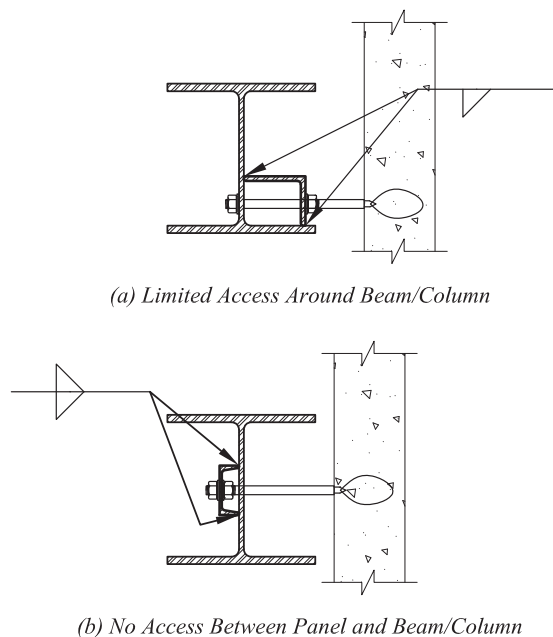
Tie-backs with little or no access around beam/column. (Adapted from reference Architectural Precast Concrete, Second Edition, PCI. Used with permission Precast/Prestressed Concrete Institute.)
